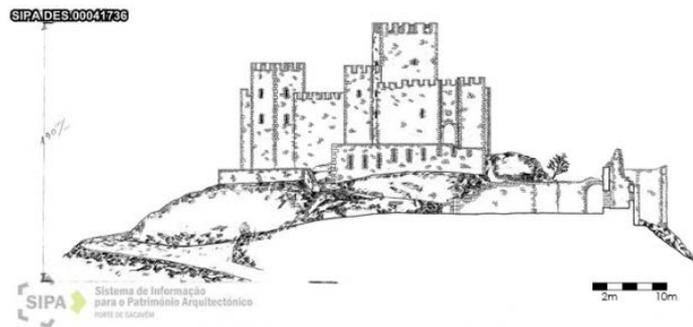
South elevation of the castle (Source: SIPA, n.d.)
